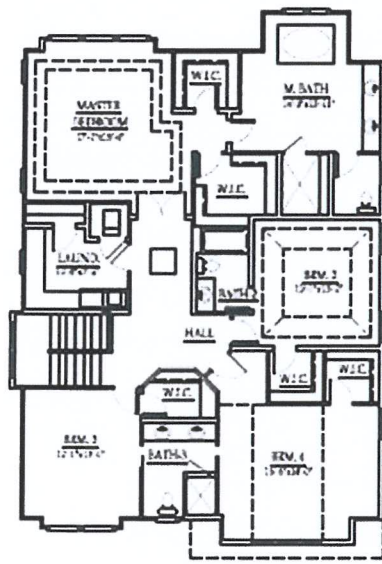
EXHIBIT D – EXAMPLE OF FRONT ELEVATION/FLOOR PLANS FOR A 38' WIDE LOT
